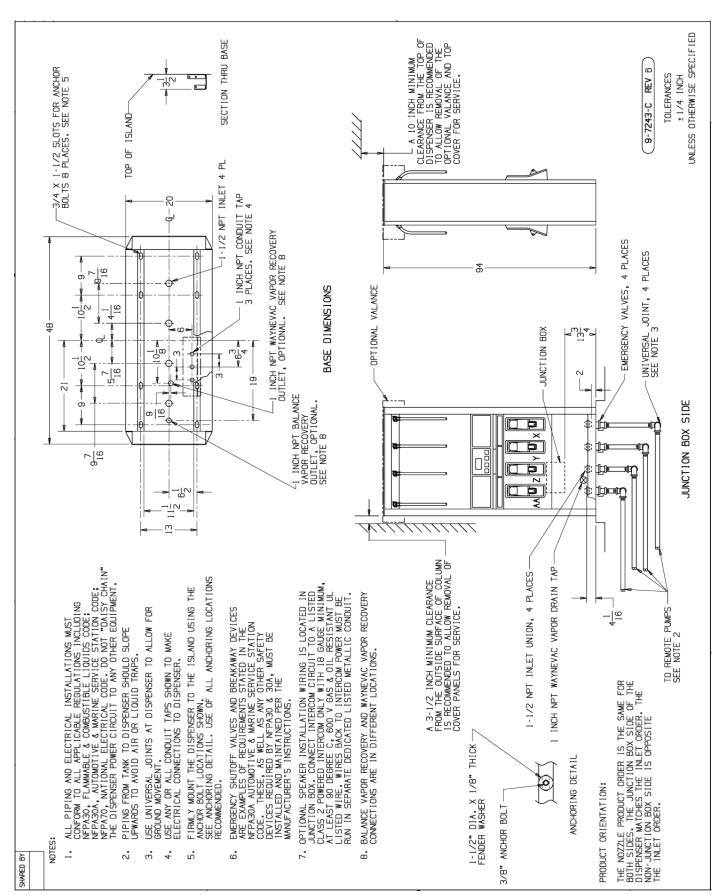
9-7243-C Installation Instructions - 4/V490D (Remote) - Except 4/V490D/U See 4-7243-C
